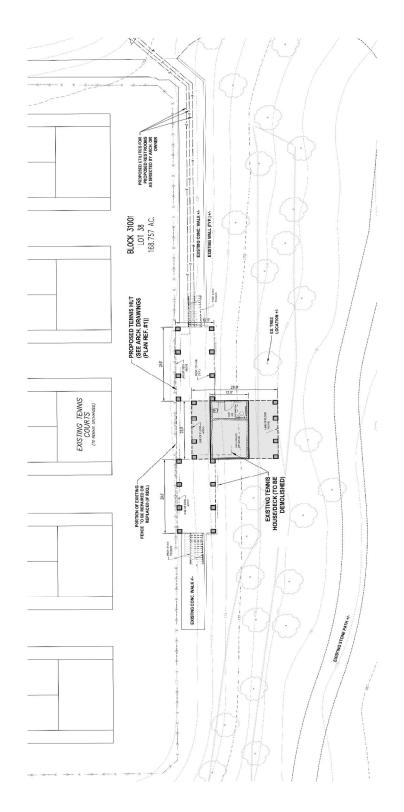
SITE PLAN TENNIS HUT Pump House & Tennis Hut – Minor Site Plan and Use Variance Plan Block 31001, Lots 38 & 39 Montgomery Township, Somerset County
